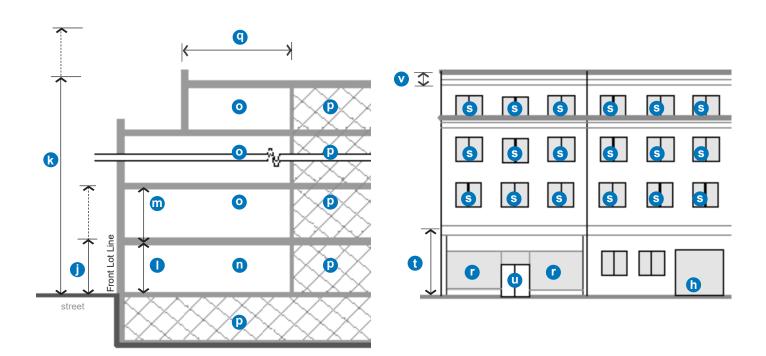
(G)(2). Limited Bay Building: Height & Use Requirements.
